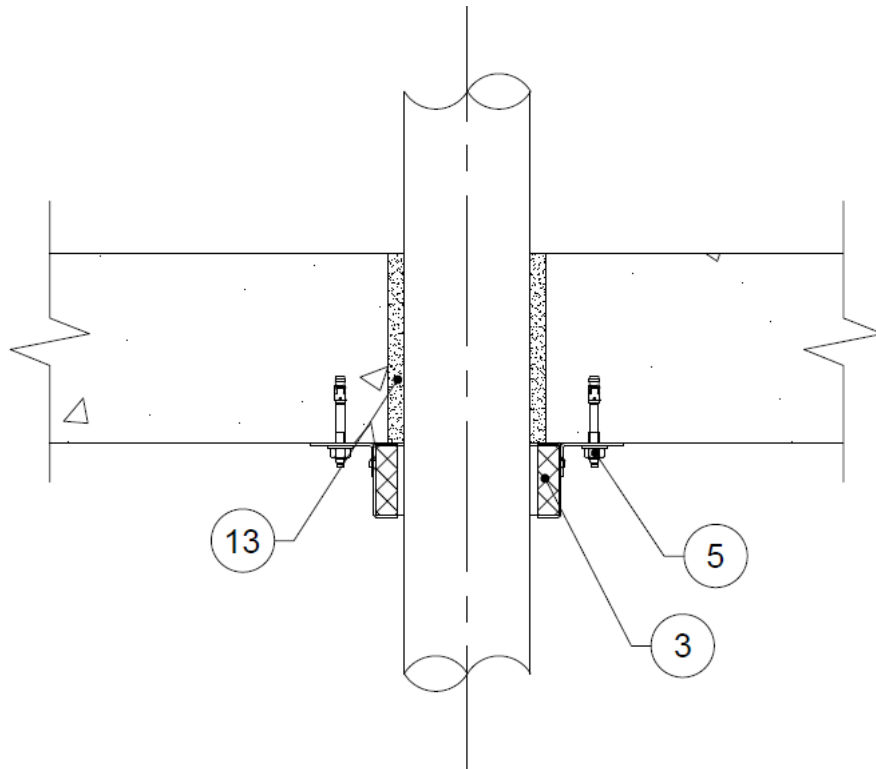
Sealant Detail around Uninsulated Pipes in concrete Floors
